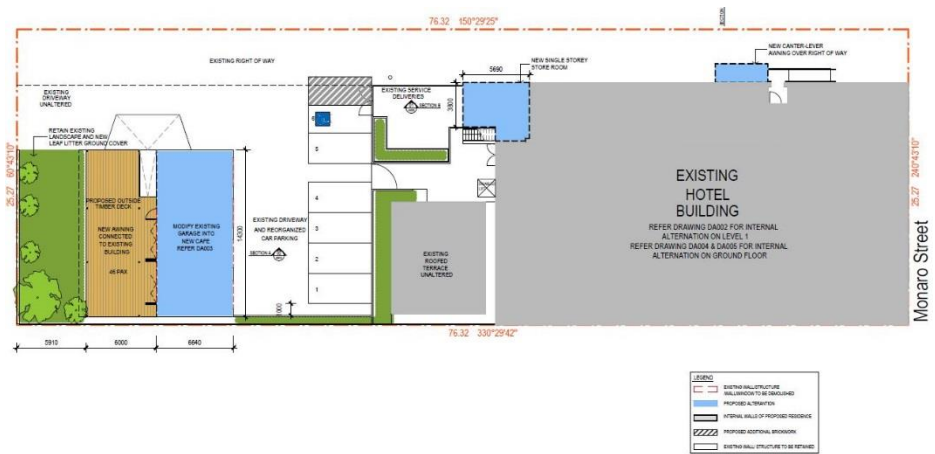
Site Plan 31 Monaro Street (Source: dezignteam)
